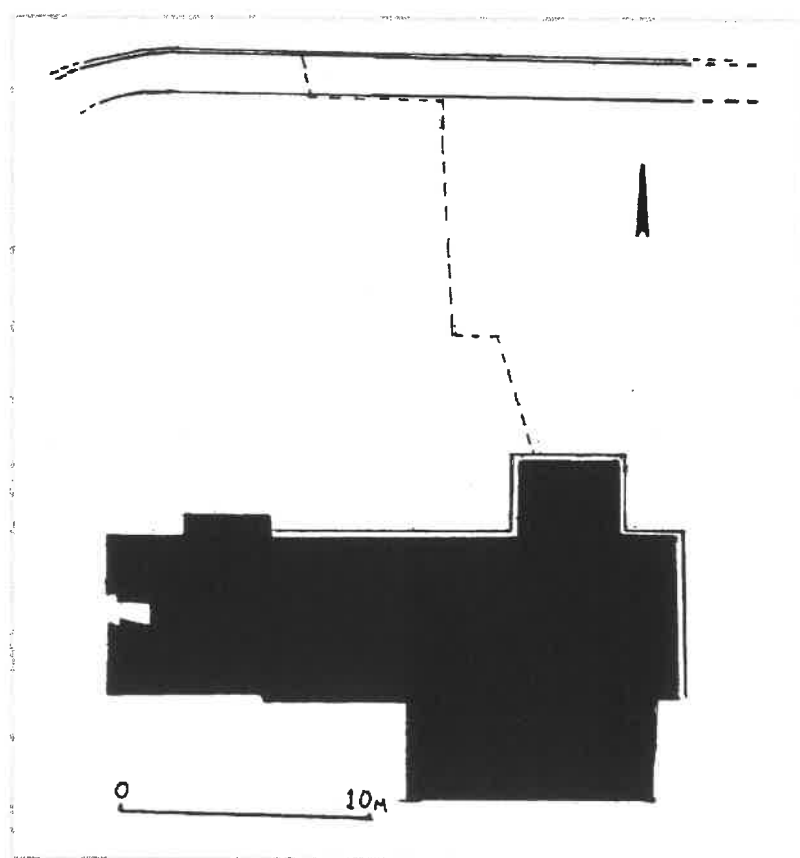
Plan of church (black) and the trench path (dotted line). The pathway and the churchyard wall are the features furthest north.
